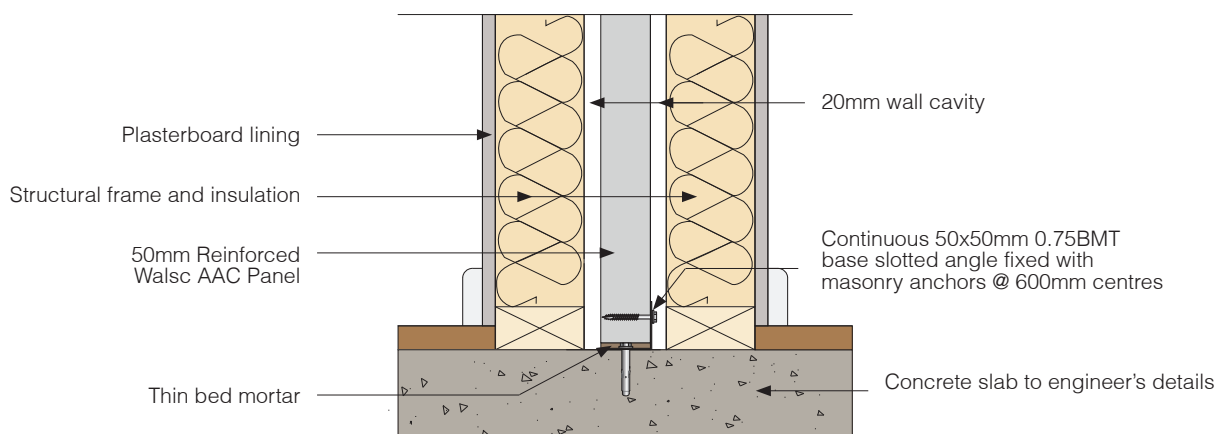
Vertically Aligned System Base of Wall Detail - Option 2
